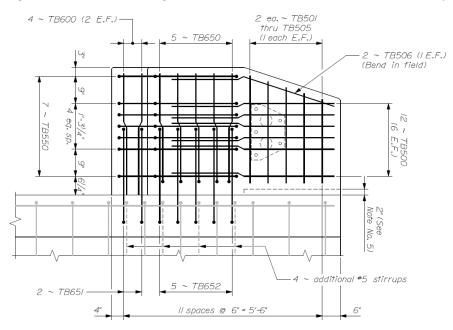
Concrete buttress for the Maine AGT to 4-Bar bridge rail.
